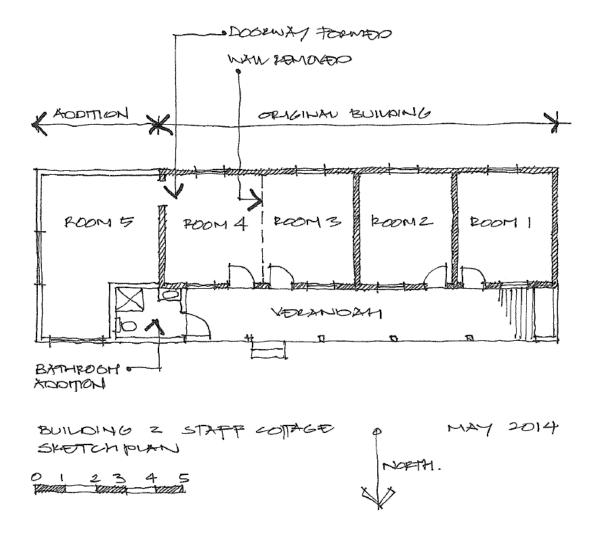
Sketch plan of Building CM5 as at 2014. Note: this plan has not been updated since 2016 renovation works. (Source: David Hobbes of Philip Leeson Architects, May 2014)
